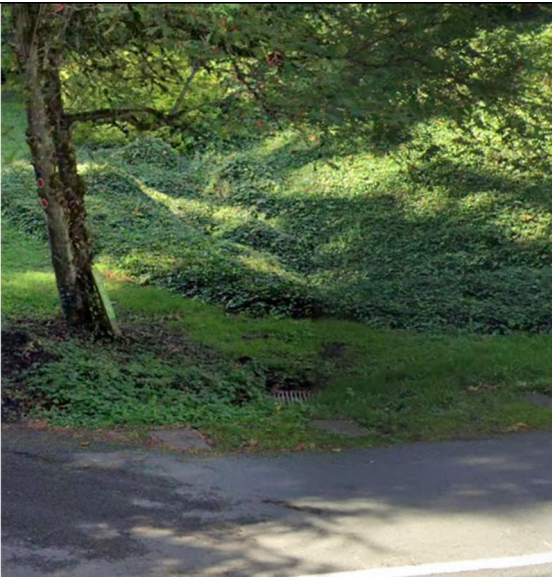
(looking northwest): type 2 catch basin. 12" concrete pipe flowing east.
